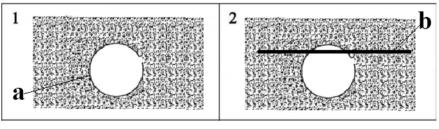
Construction stages of ECPPS (a: TBM lining; b: piles)
